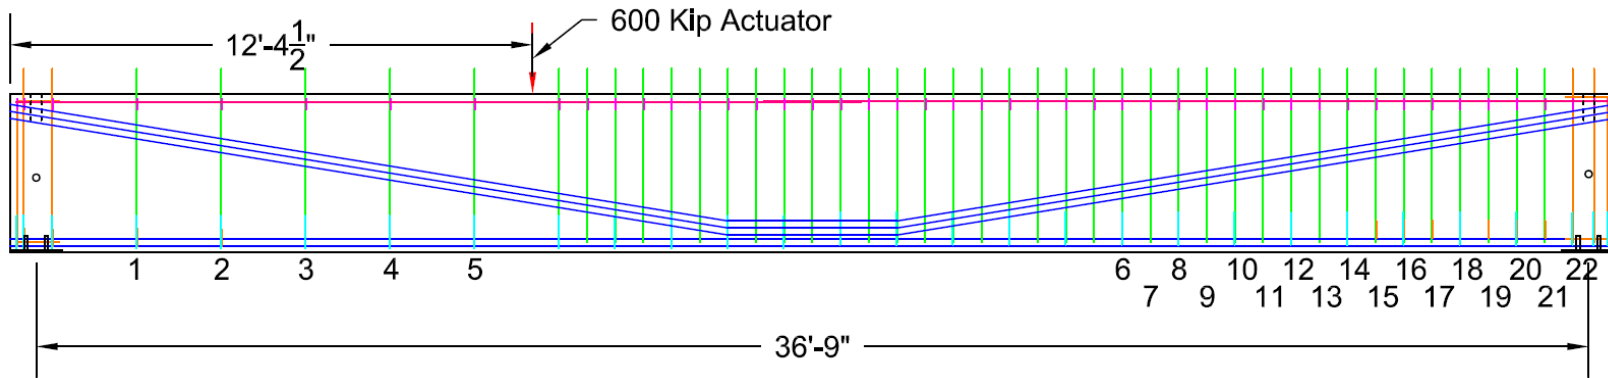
Elevation view of 45M₂₄W girder including load point and nominal span length.
